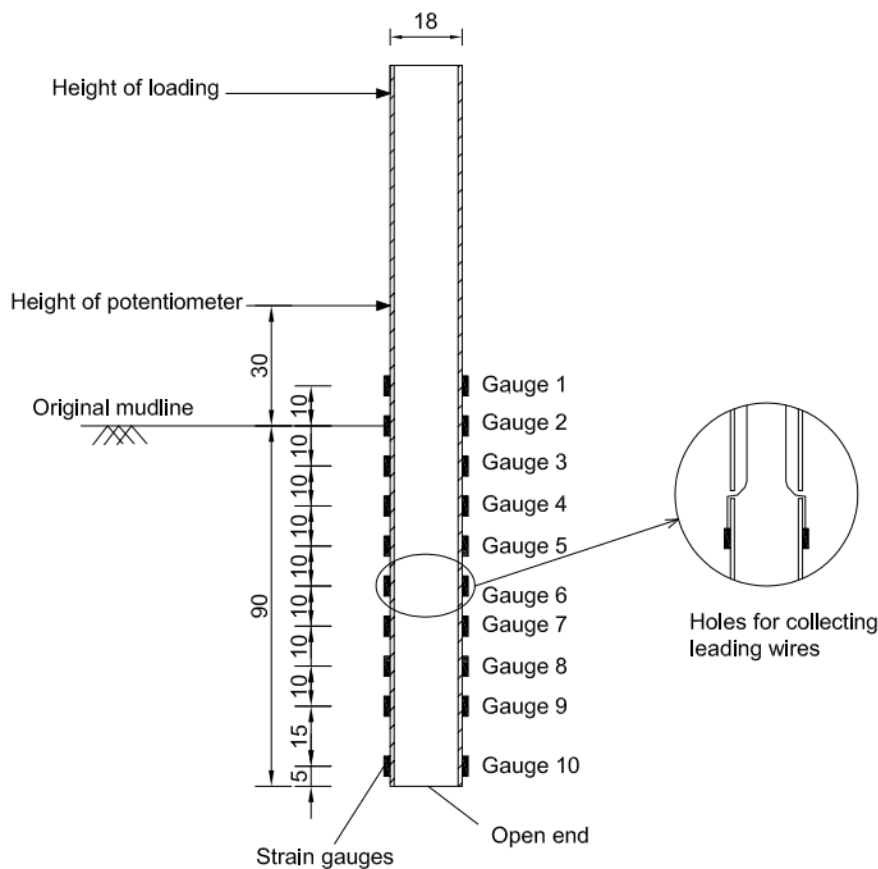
Model pile schematic diagram with strain gauge layout (dimensions in mm)
